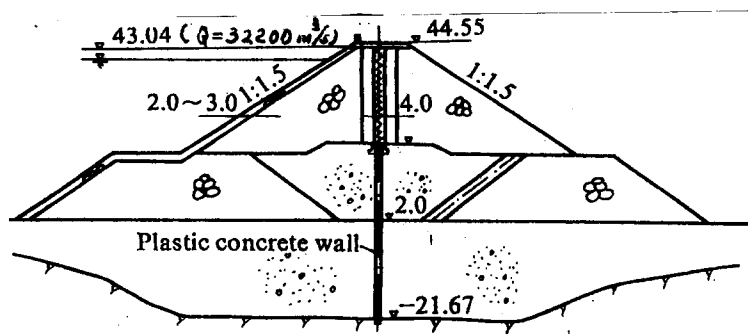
Sectional Drawing of Shuikou Cofferdam.
